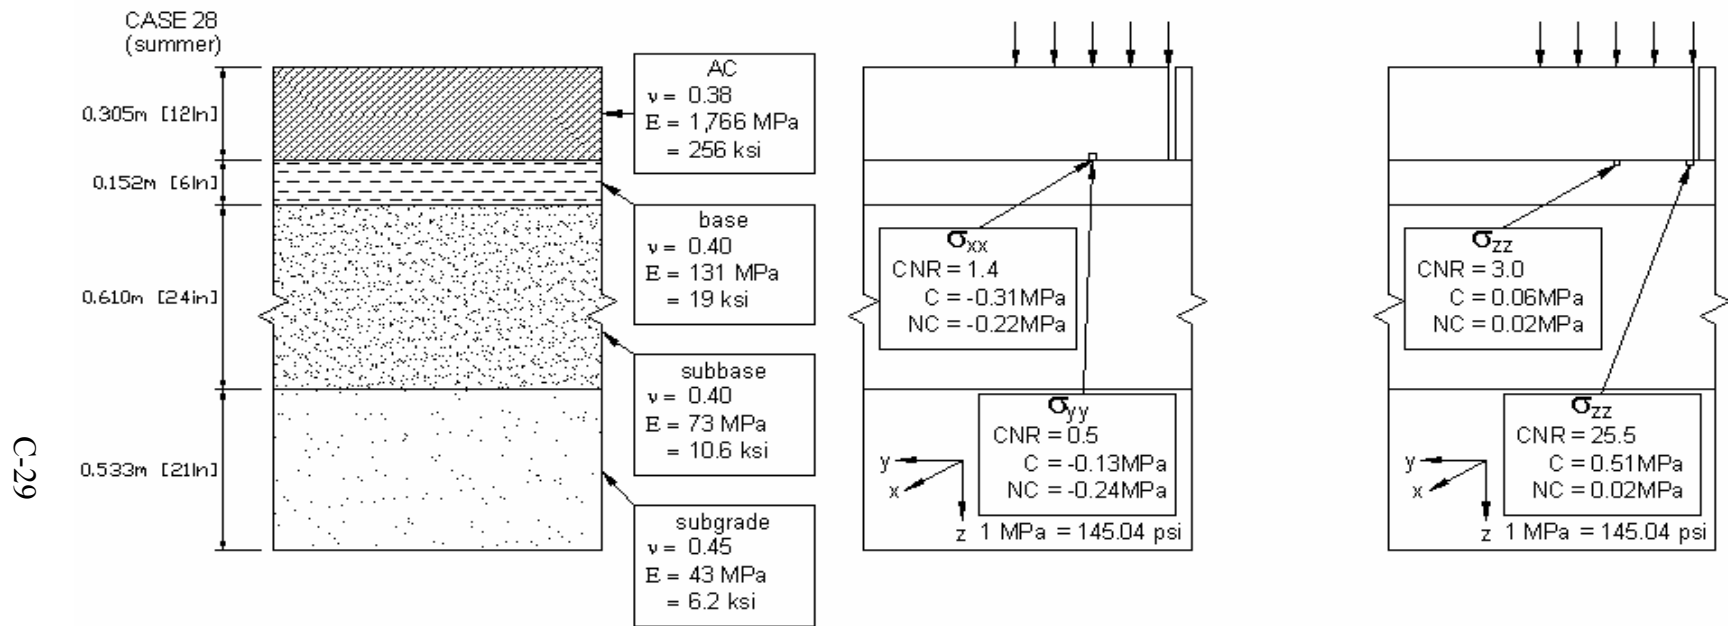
Summary cross section for case 28, (C – stress in cracked pavement, NC – stress in pavement with no crack, CNR – crack/no crack (stress) ratio)
